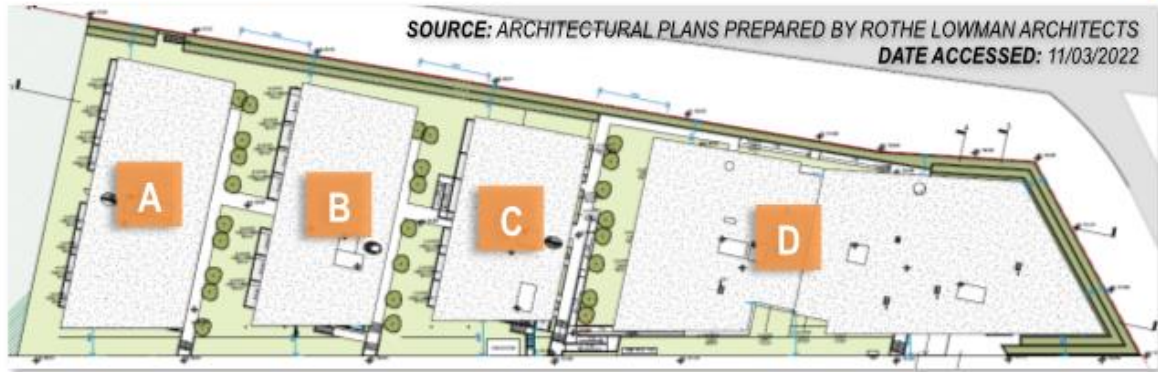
SITE PLANS AND BUILDING LAYOUT
